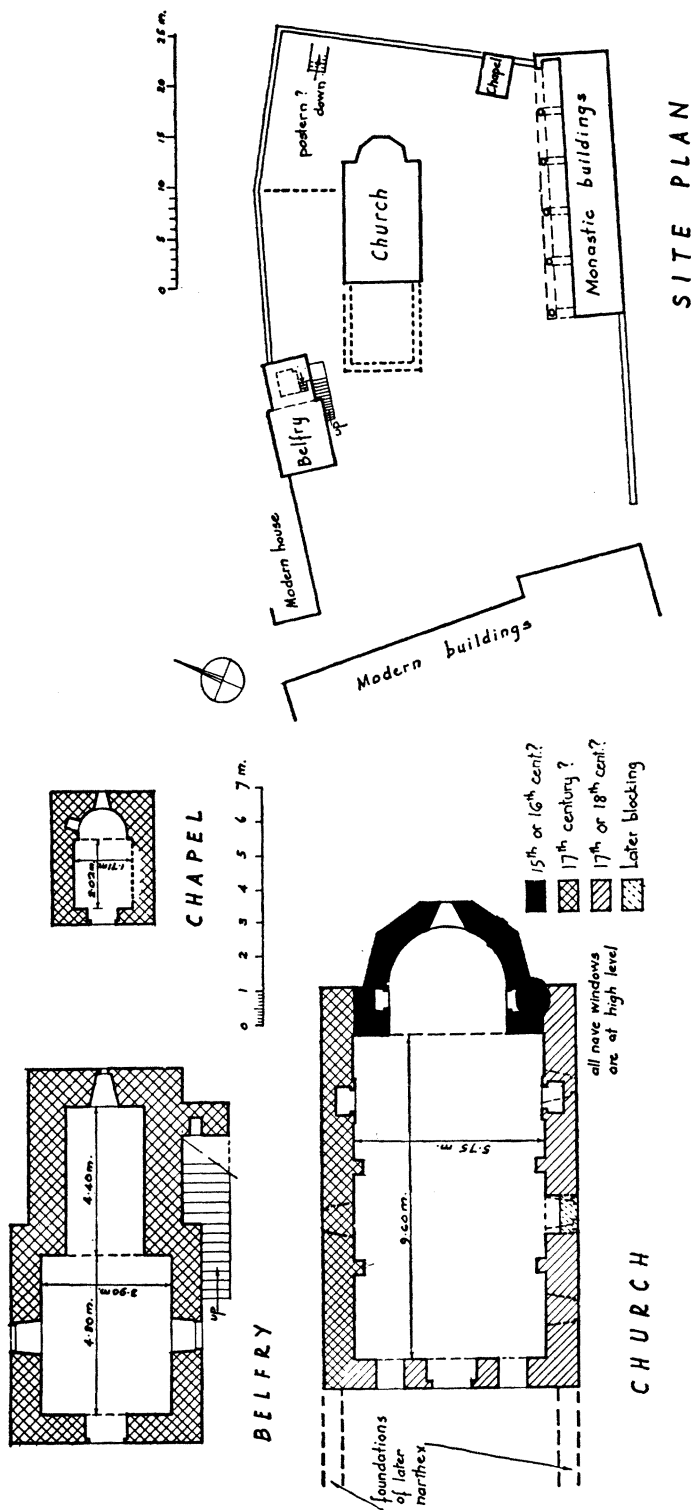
Plan of church, chapel and belfry, and site plan, of Kaymaklı monastery.
